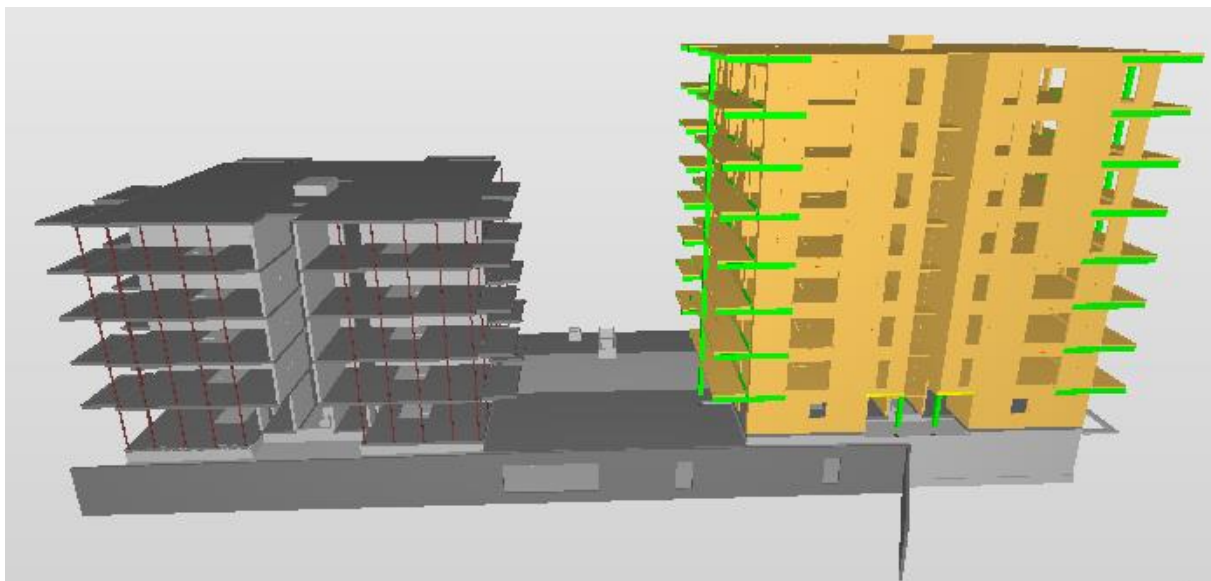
Maskinparken TRE to the right and Maskinparken 2 to the left with the concrete underground car park underneath. The picture is taken from the Solibri model of the buildings.
